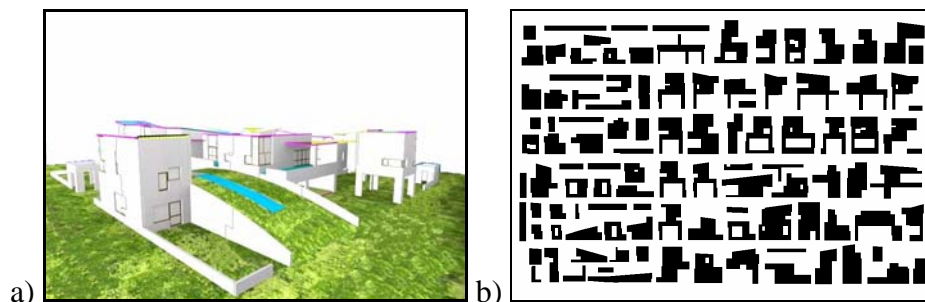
a) Architectural model, b) 108 concrete panels used for the case study
